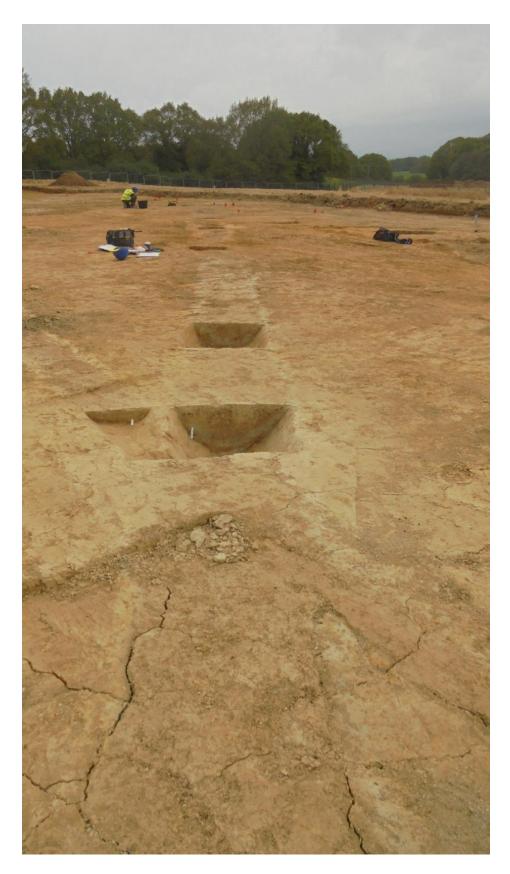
Ditch [147] cut by gully [216], looking northwest.
